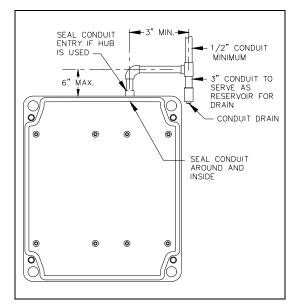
Top entry conduit installation for nonmetallic enclosures (NOT recommended)
